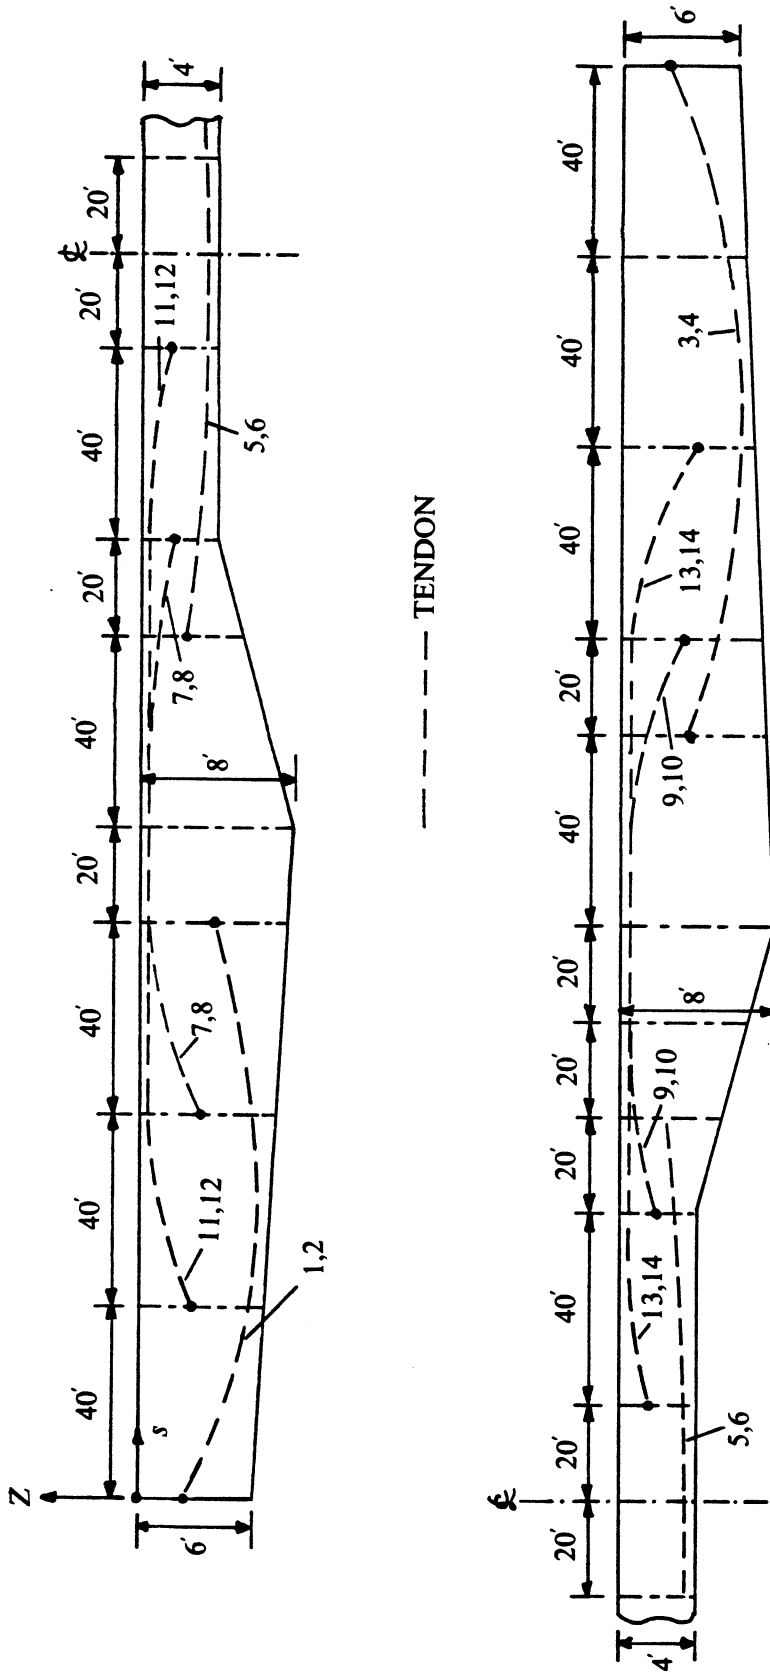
EXAMPLE 4.5 - THREE-SPAN CURVED NONPRISMATIC PRESTRESSED CONCRETE BRIDGE
